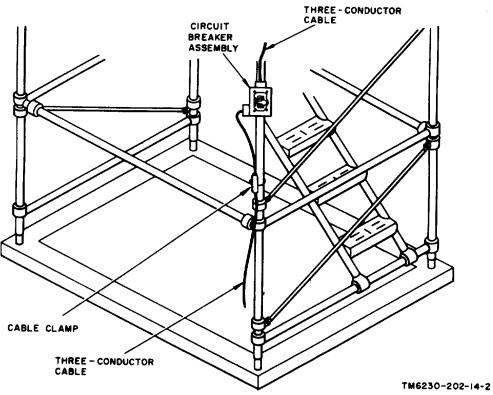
Light Set, Ground Obstruction Marker MK-221(*)/G, typical installation.
